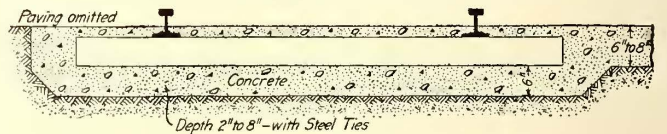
BALLAST CONCRETE CONSTRUCTION, EITHER WOOD OR STEEL TIES, 2 FT. TO 5 FT. CENTER TO CENTER
